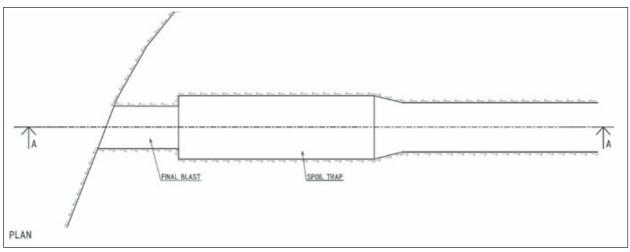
Preliminary design - plan view of underwater piercing blast round, piercing chamber and spoil trap. (Illustration: Norconsult)
